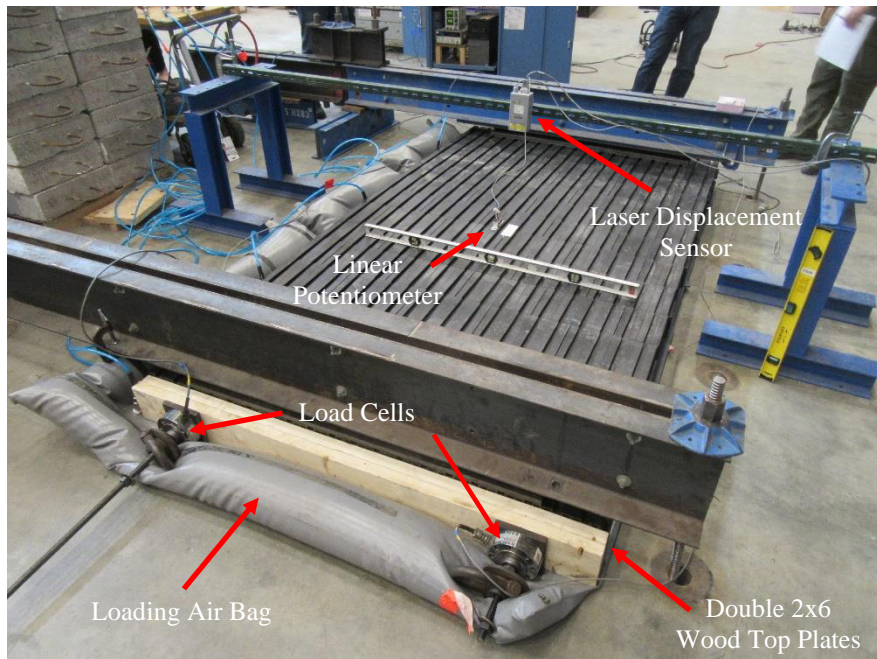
Instrumentation and Loading Bags for Out-of-Plane Flexural Test
